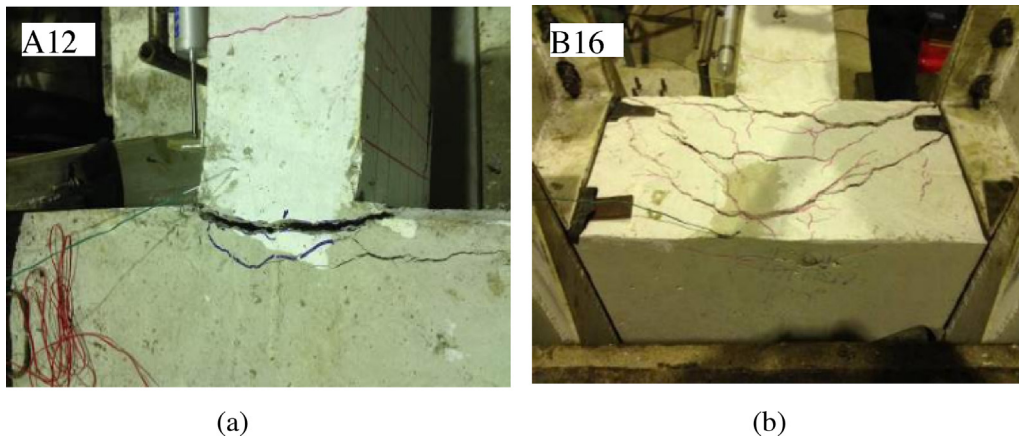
Failure patterns in cast-in-place specimens: (a) specimen A12, and (b) specimen B16.
